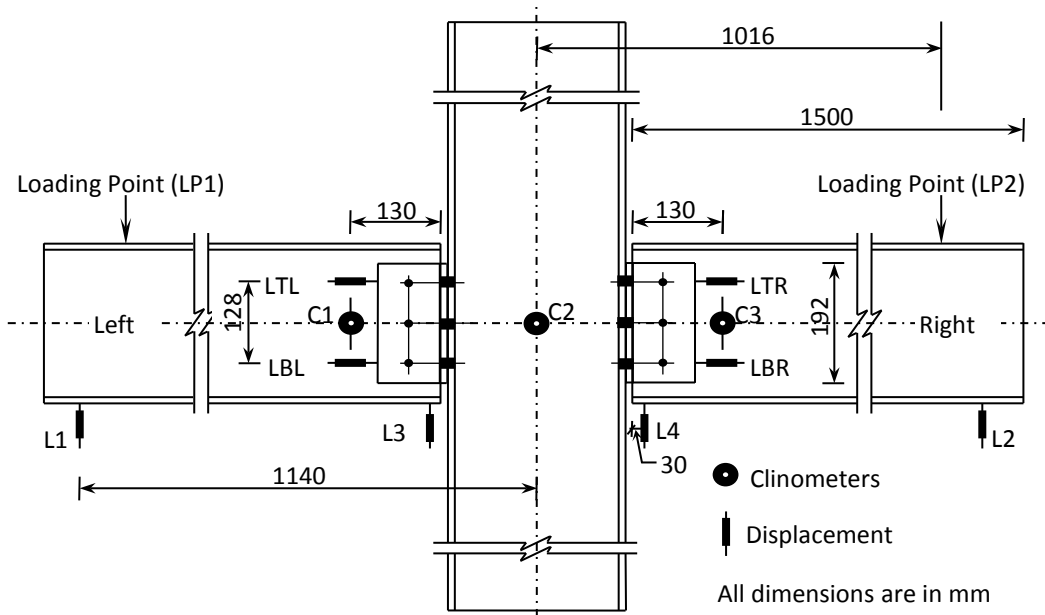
Location of instrumentation in nominally pinned beam-to-column joint tests (all dimensions are in mm).
